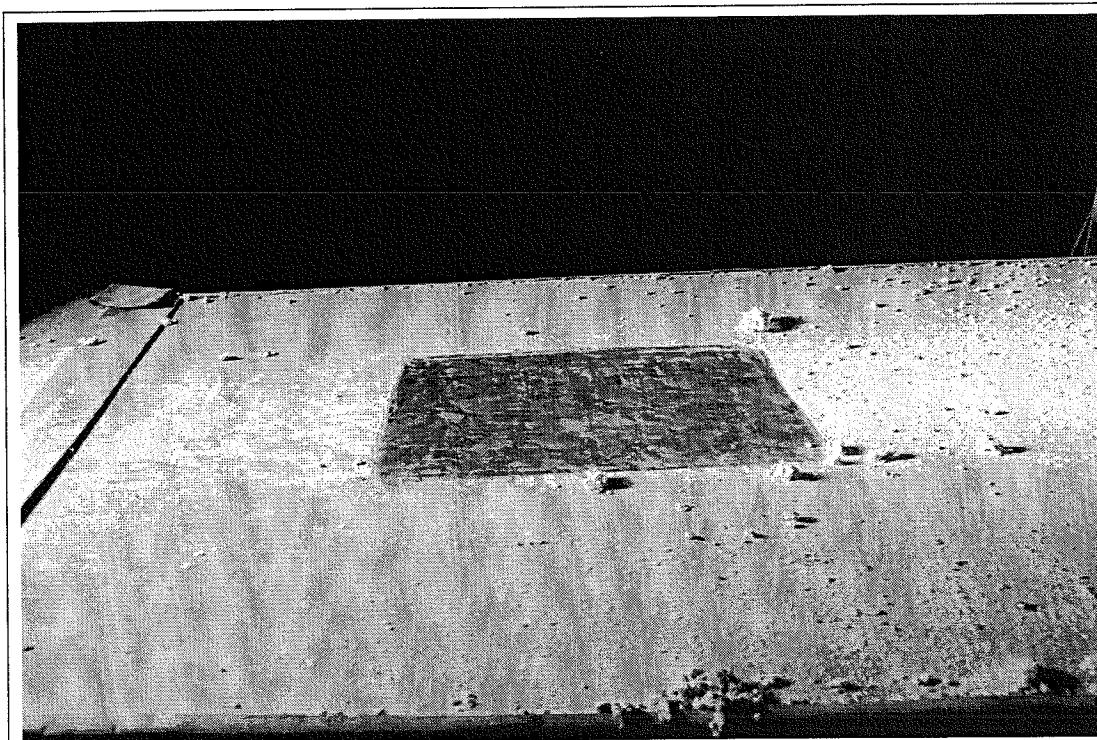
Main Terminal, 3rd floor, Men's Rest Room - Close-up of dust sample #6 location (top of HVAC duct)
